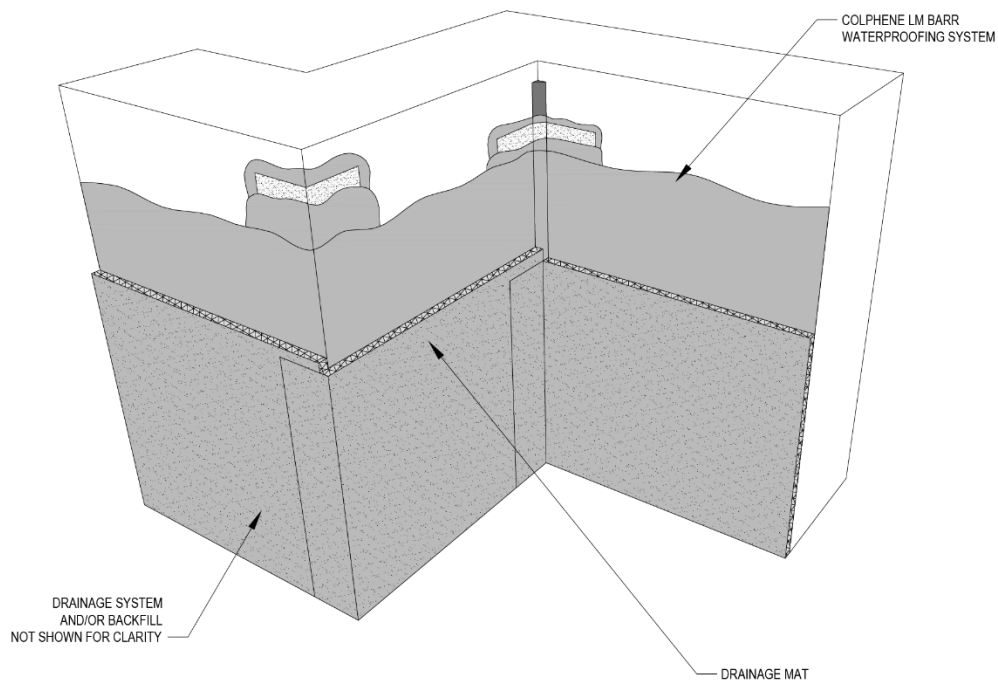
Drainage Mat Protection Course At Inside/Outside Corners
